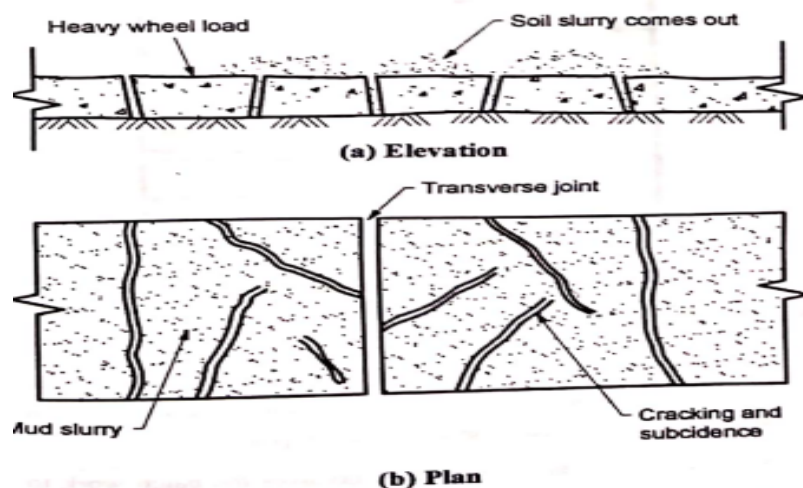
Mud pumping and failure of pavement
